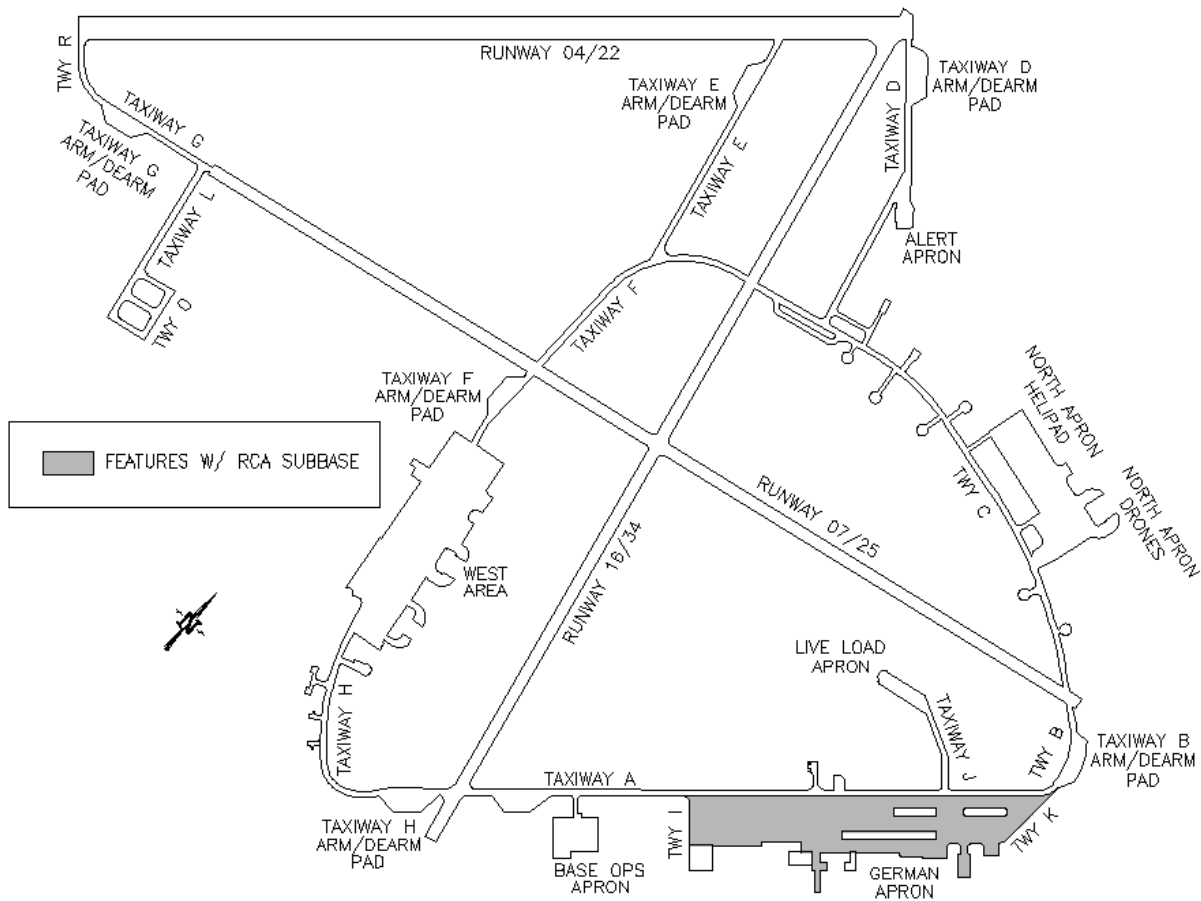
Layout of airfield pavements at Holloman AFB, New Mexico.
